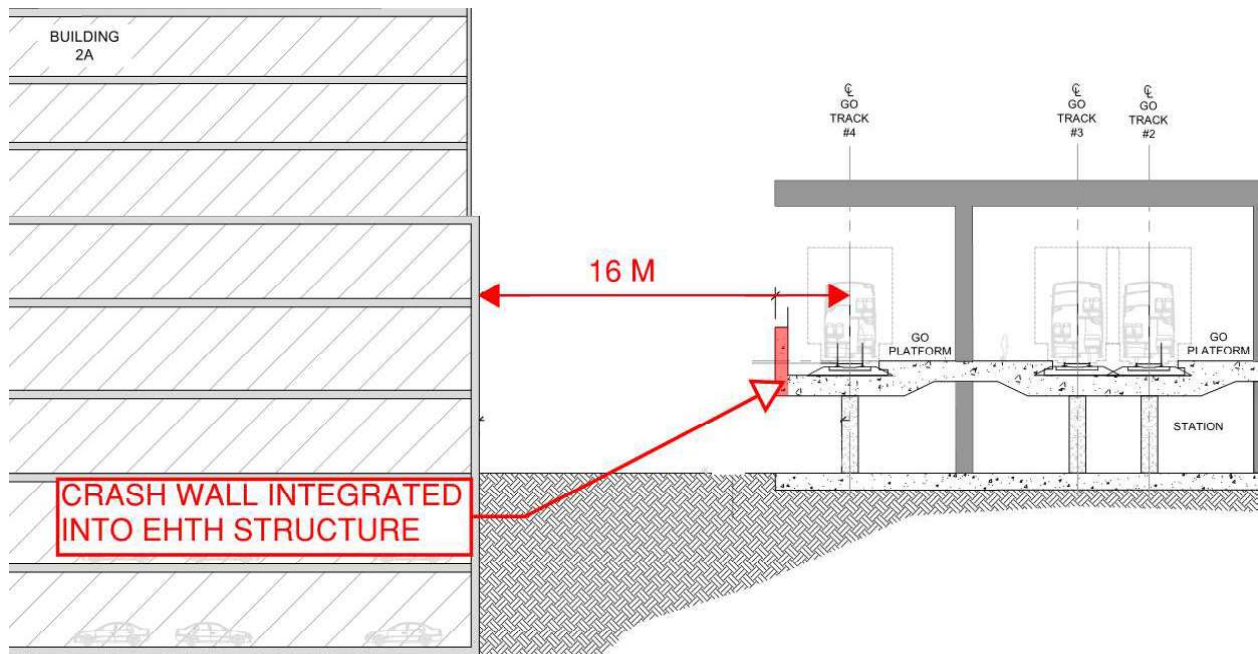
EHTH Crash Wall/Setback (Typical)
